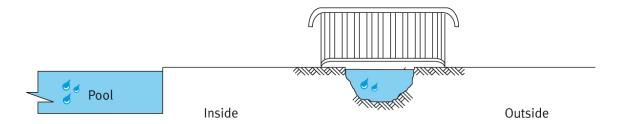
(a) Access provided over the permanent body of water (bridge, walkway or Pontoon or the like)
